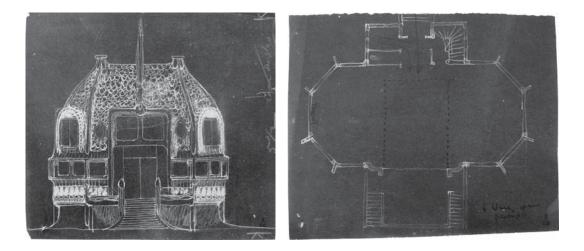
Perret. Maison bouteille. Elevation. FIG. 102 Perret. Maison bouteille. Ground floor plan.
